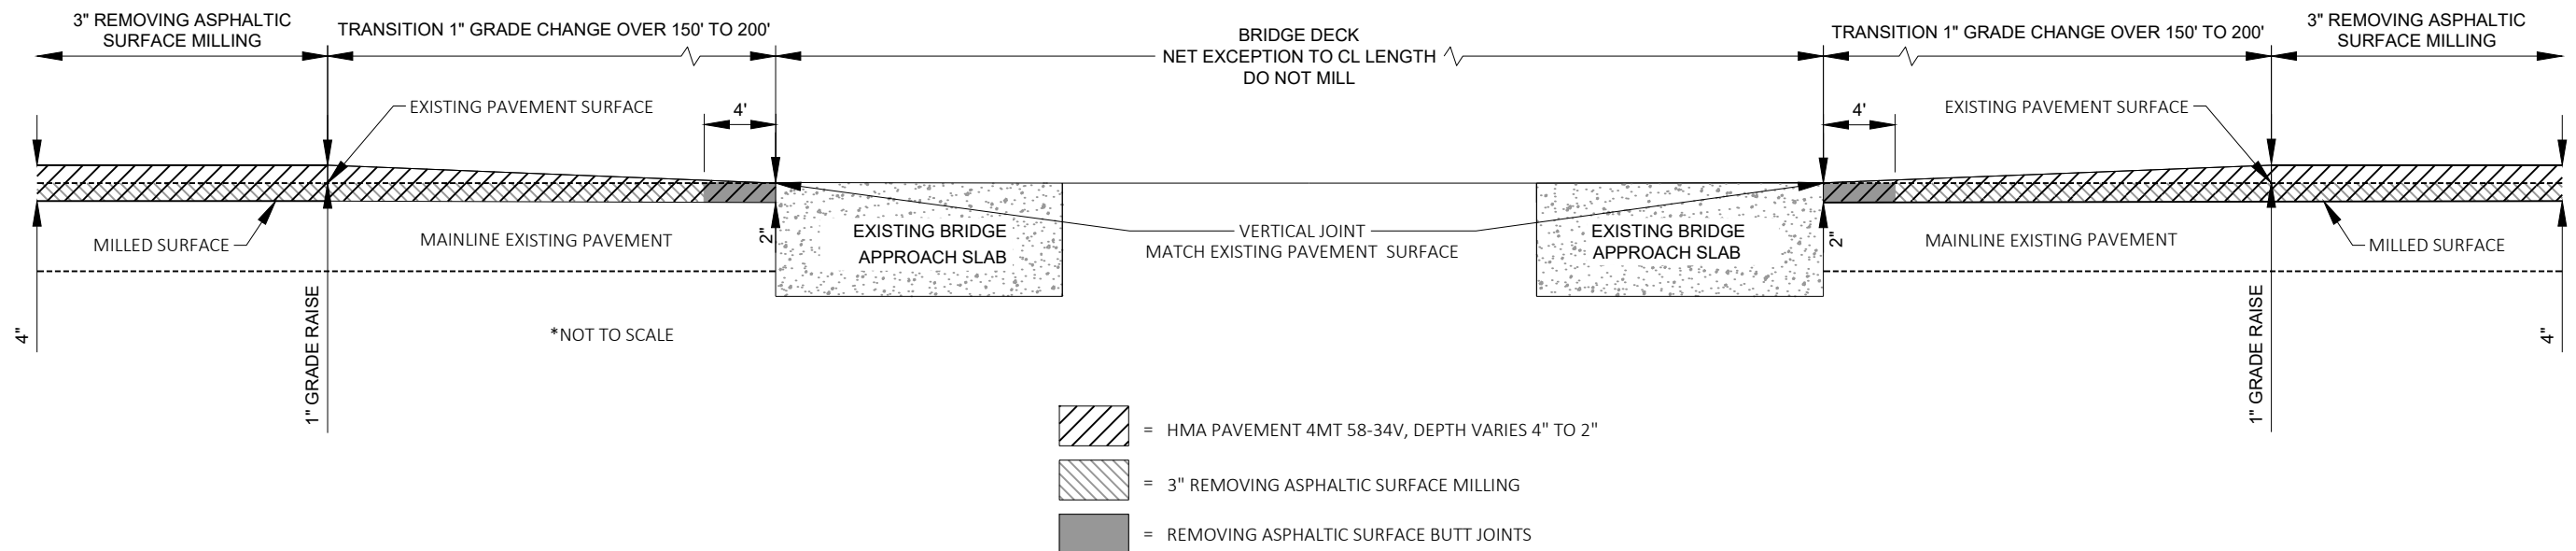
DETAIL OF MAINLINE CONSTRUCTION JOINT - BEGIN OF PROJECT
